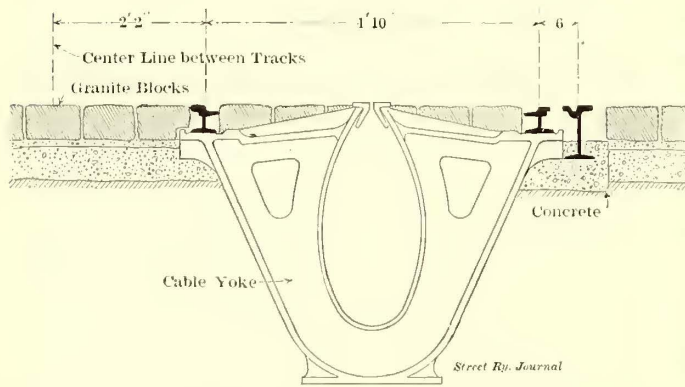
SECTION SHOWING 9-IN. RAIL OUTSIDE CABLE YOKE
